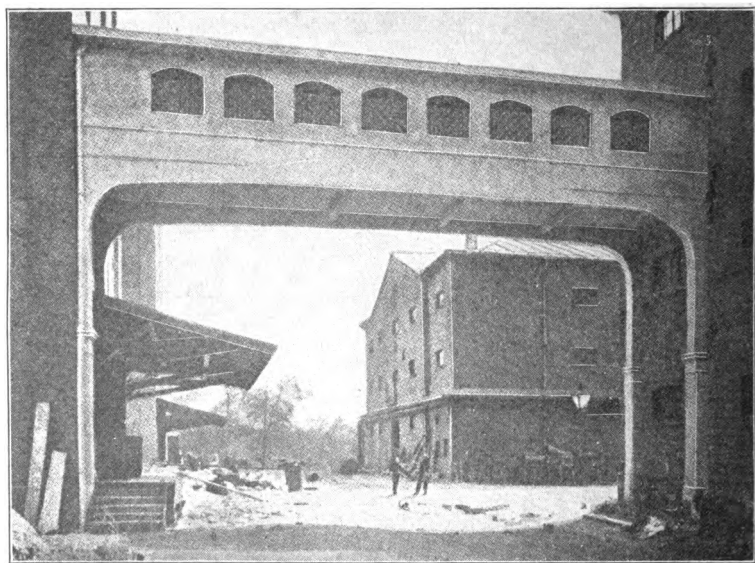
Tubular Bridge connecting two Refrigerators.
